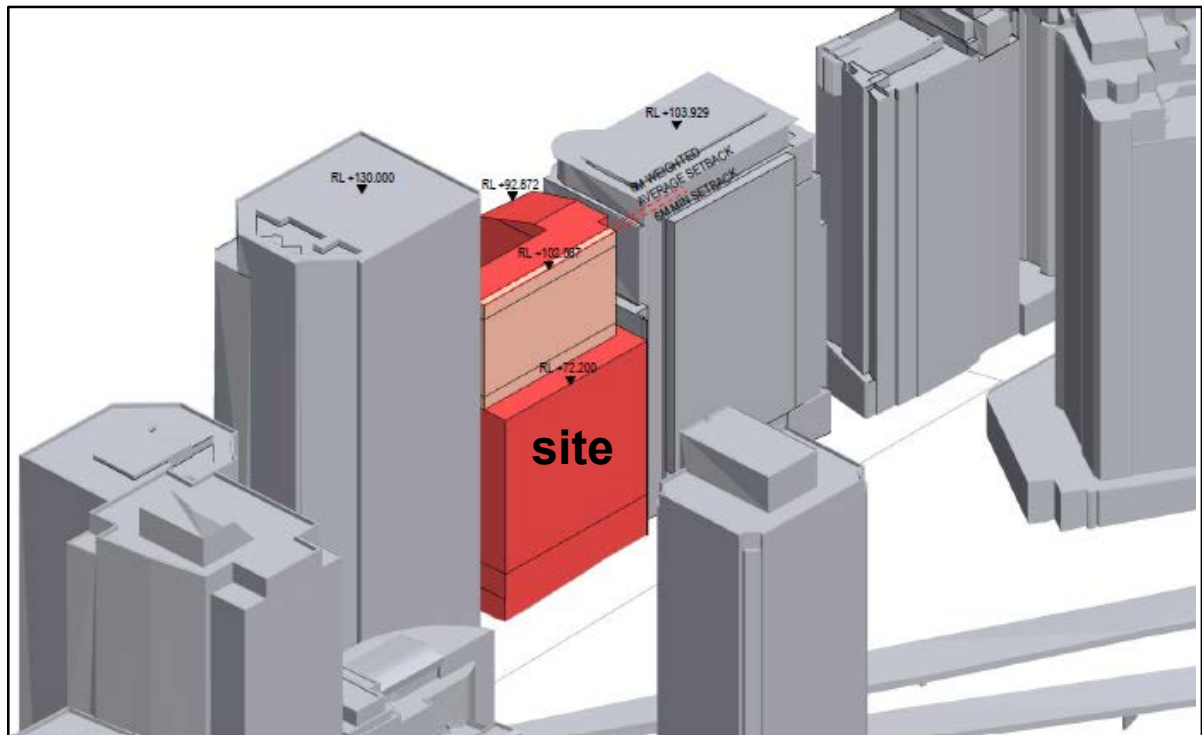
Proposed building envelope as viewed southeast from Kent Street
